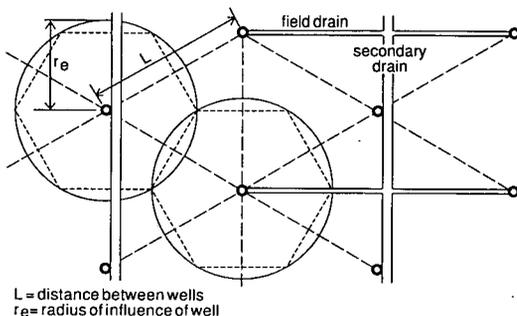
Wells in a triangular configuration with the required lay-out of field drains and main drains for the discharge of drainage water
